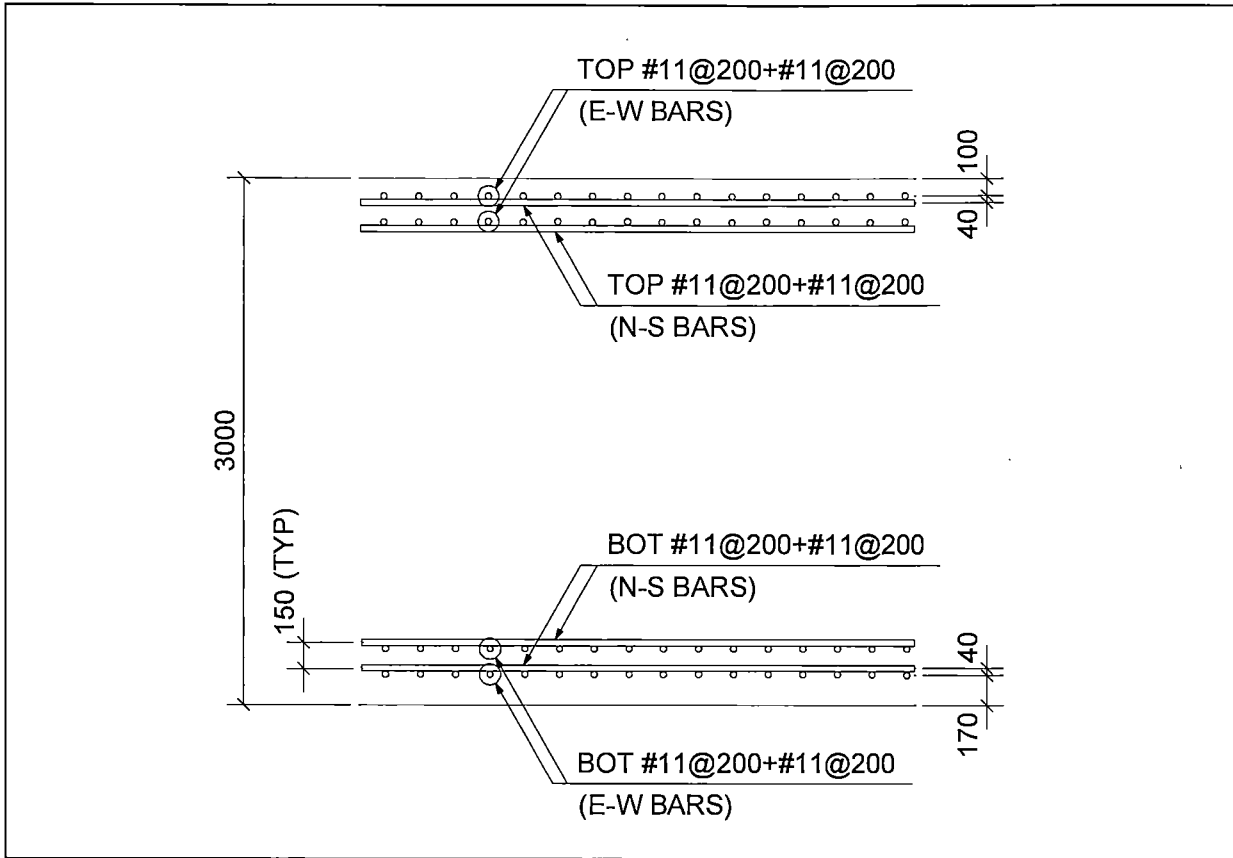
Assumed Basemat Rebar Arrangement (unit: mm)
